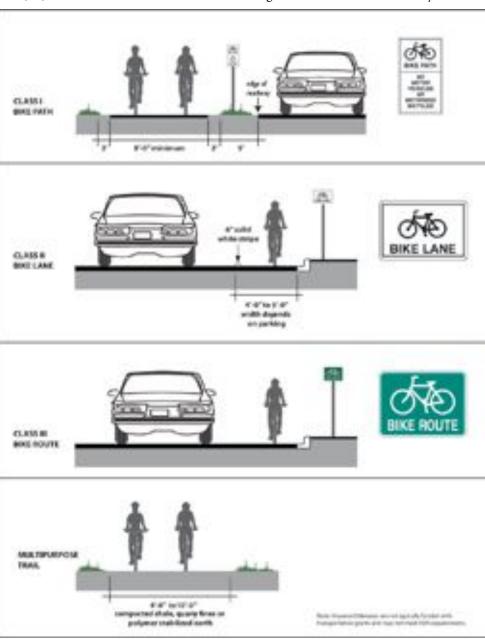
Cross sections showing Caltrans minimum design standards.
